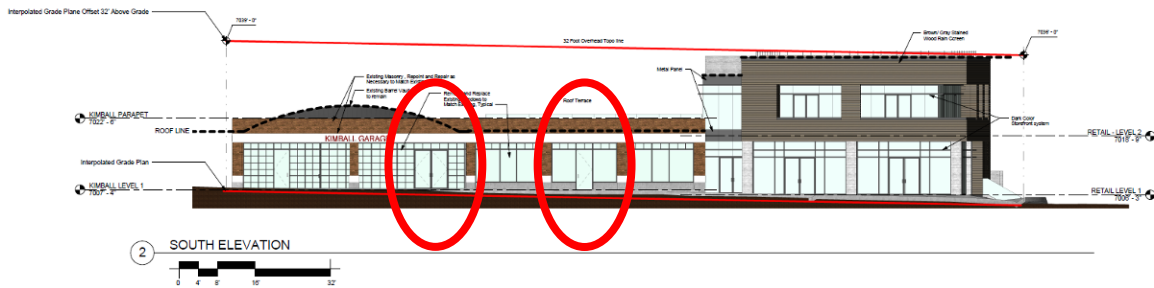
Proposed location of double-doors beneath recessed southwest corner and single door on principal Heber Avenue façade.
